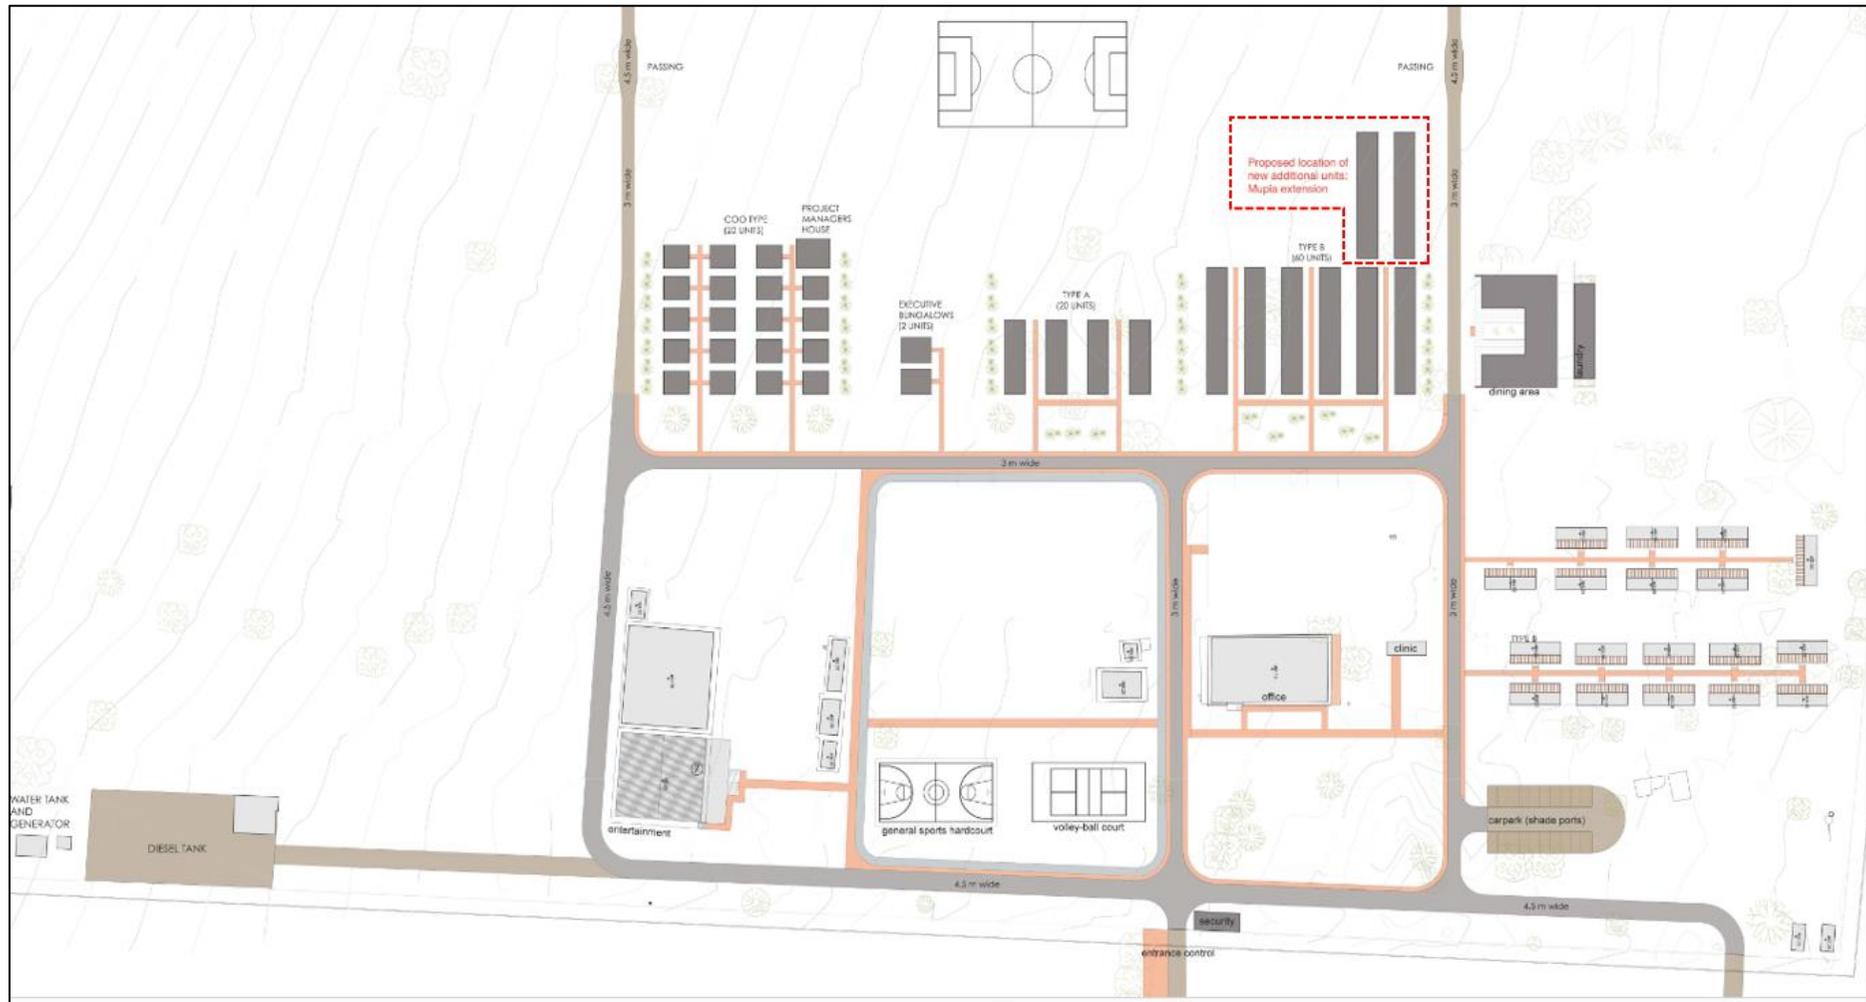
Existing Project Layout - Namanhumbir camp expansion
